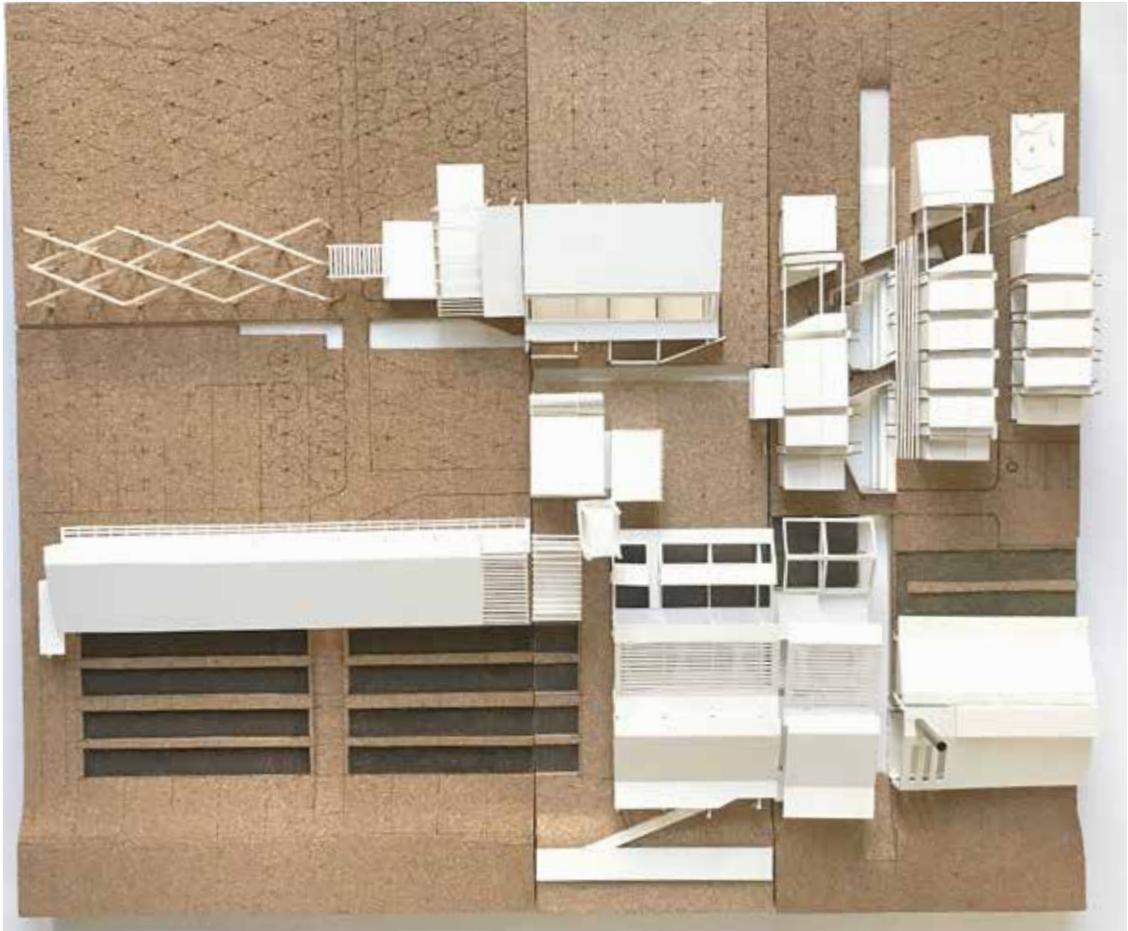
Section models 1,2,3 on plan (Author, 2018)
